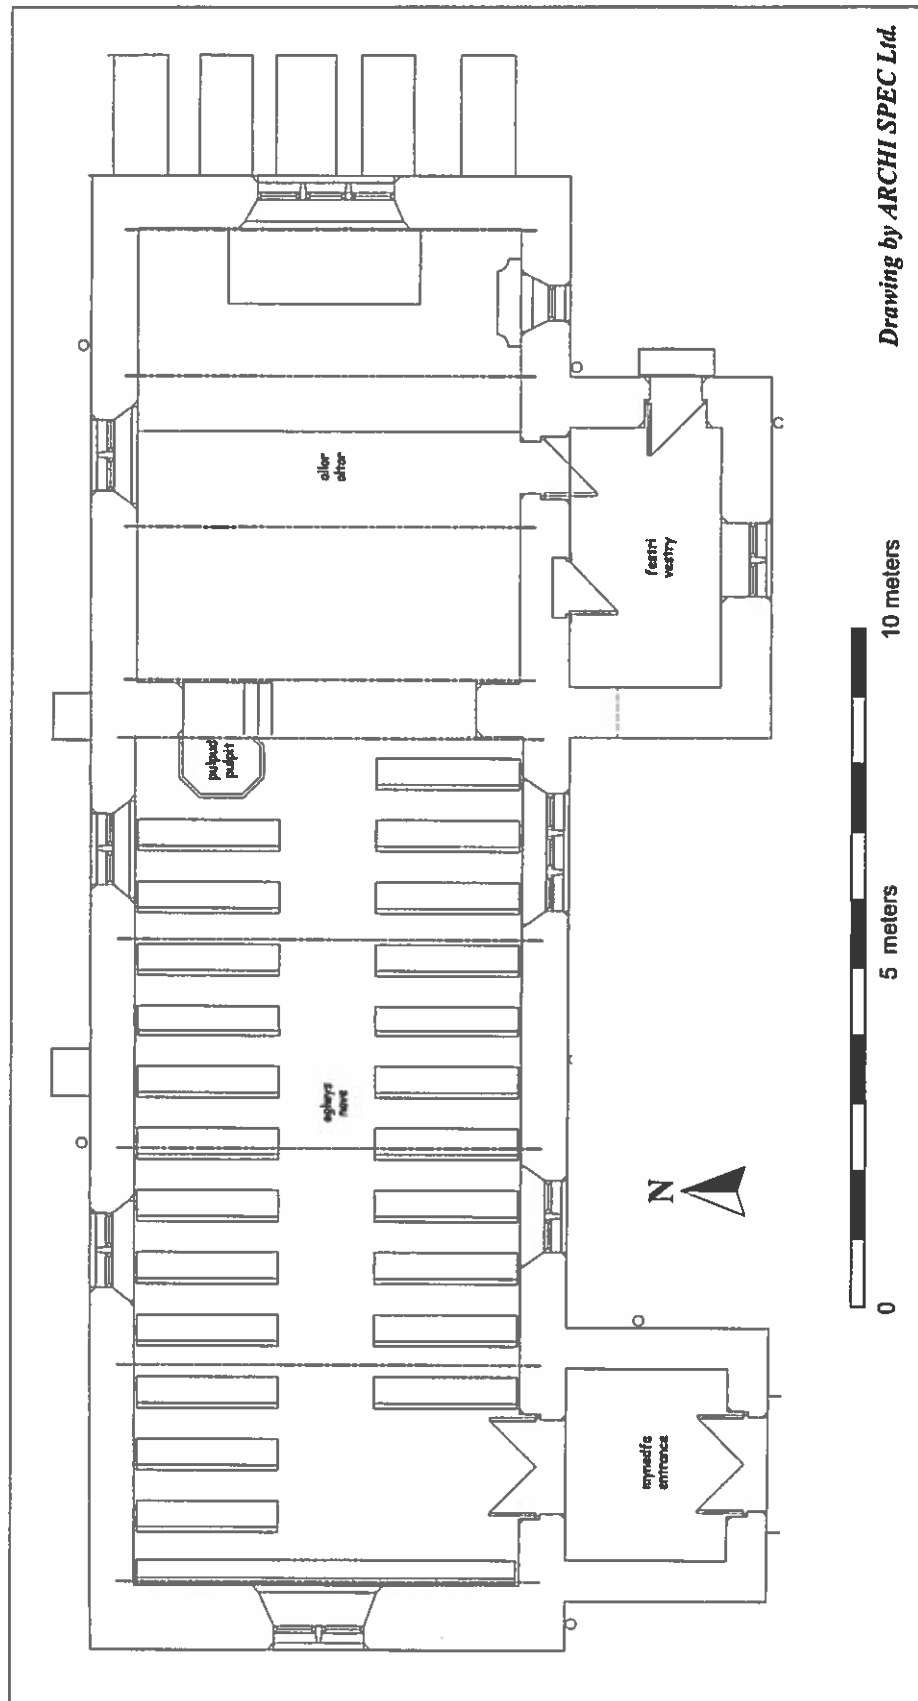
Architects ground plan of Nant Cwnlle Chapel prior to conversion.
